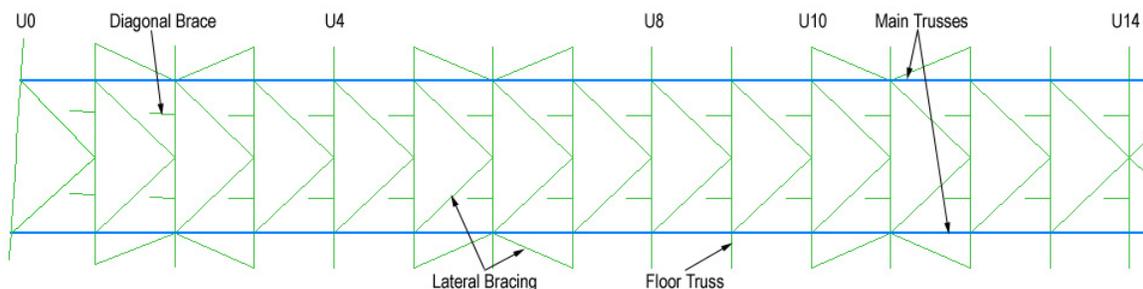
Plan of South Half of Top Lateral Bracing and Floor Trusses
